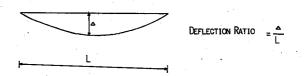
A - DEFINITION OF DEFLECTION RATIO FOR LOAD BEARING WALL STRUCTURES
